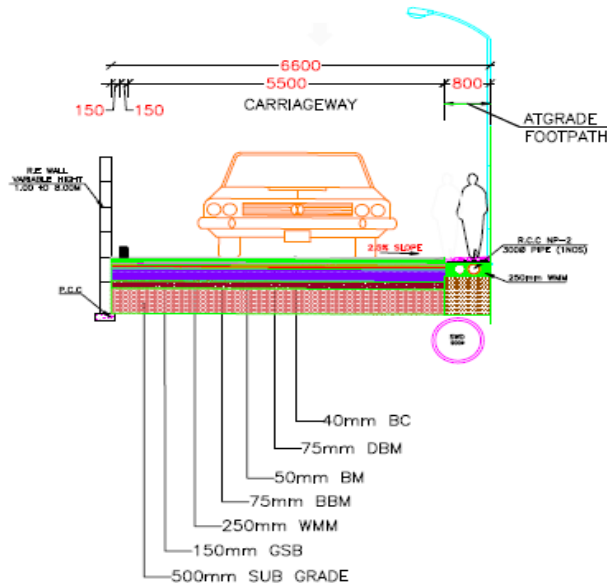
A Typical cross section of any Road Construction project showing factors which affects its construction cost.
